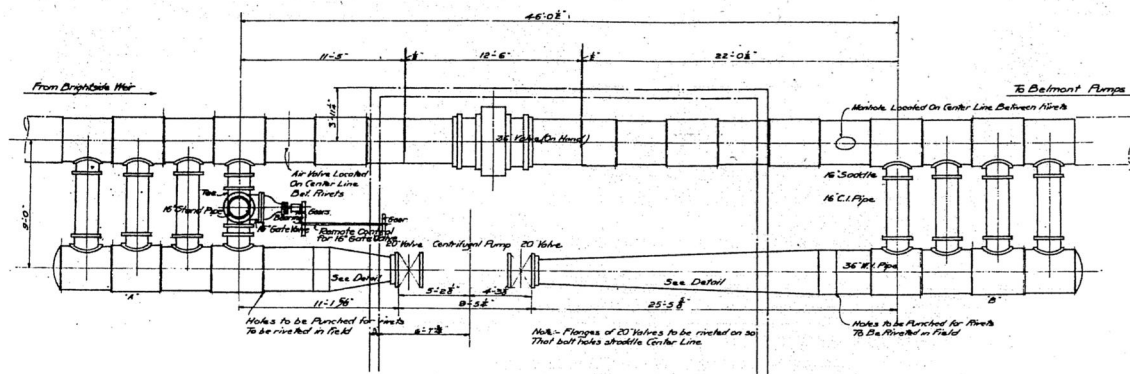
Ravenswood Pump Station Pipe Arrangement (SVWC drawing)
